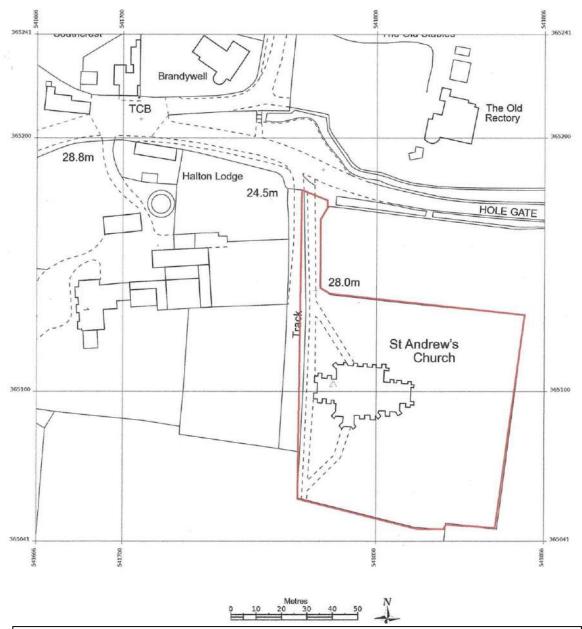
Plan showing the site location at a scale of 1;1250 at A4, (extract from Architects plan)
